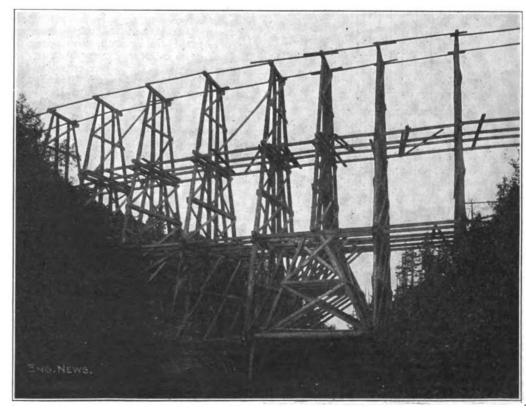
HIGH TRESTLE WITH A-FRAME SUPPORTING A BENT OVER A 40-FT, OPENING,
